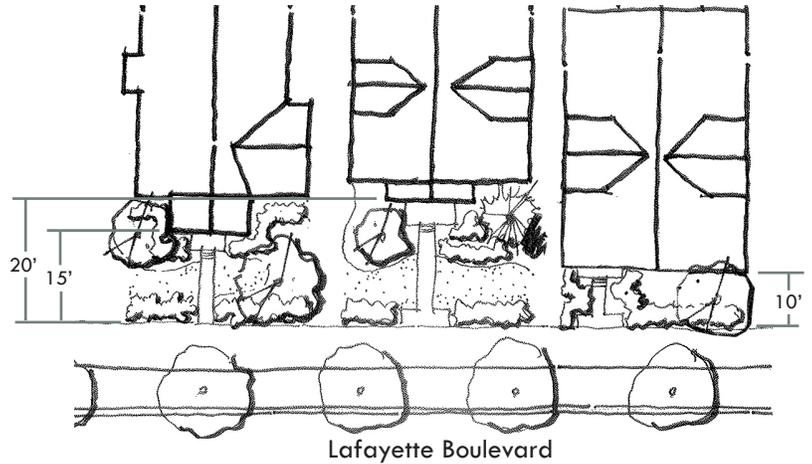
Maximum and minimum residential Downtown District dimension along Lafayette Boulevard frontage
